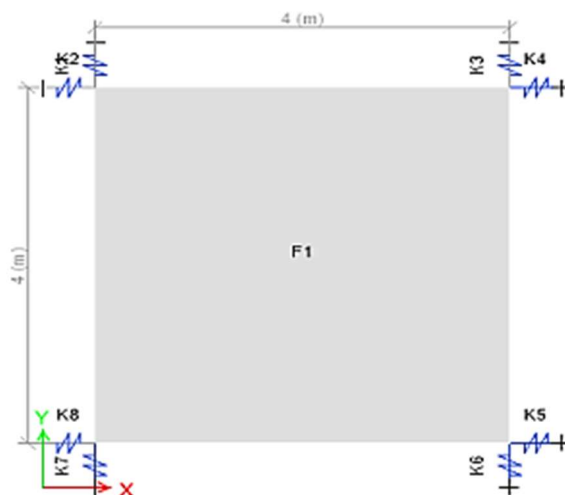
Symmetrical building in a one-story plan with the actual size of the column
